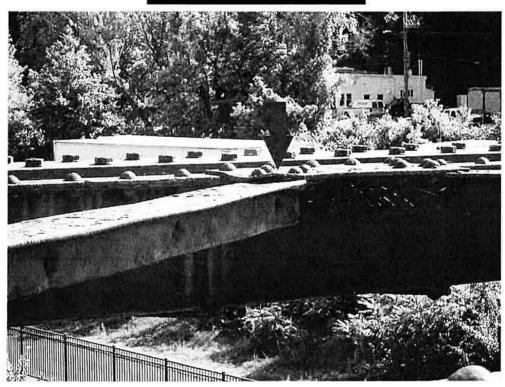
North tower outer truss, member U12-U14 lateral bracing connection plate - pack rust and minor bends.
